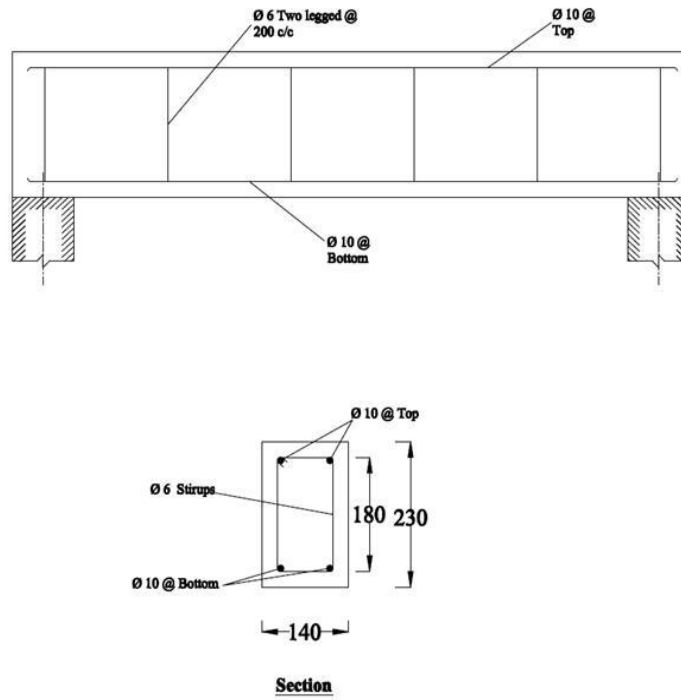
Flexural Strength Test Reinforcement Arrangement.
